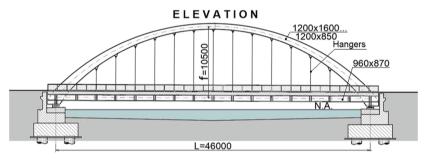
Elevation of the Bridge with four carriage-lanes.
